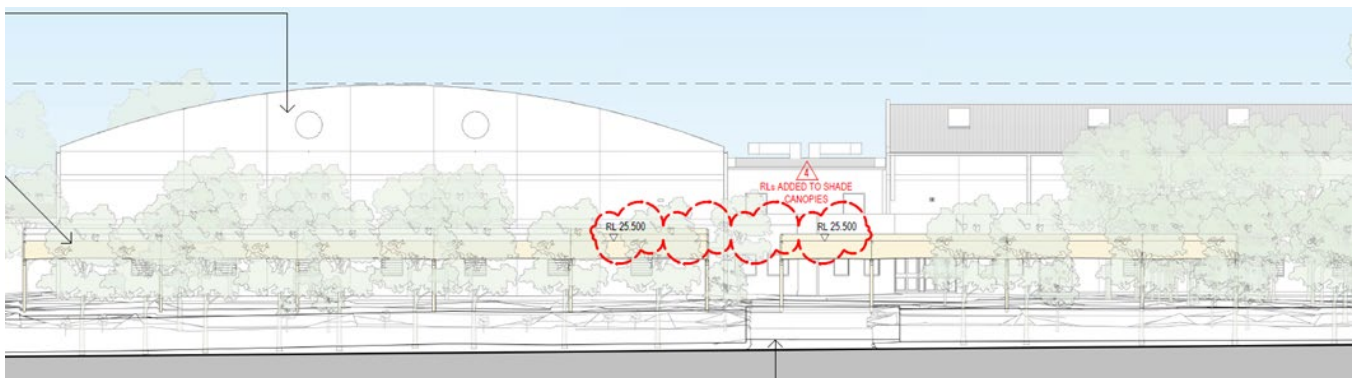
Extract of Section the East/Stewart Street Elevation (Source AJC Architects)
